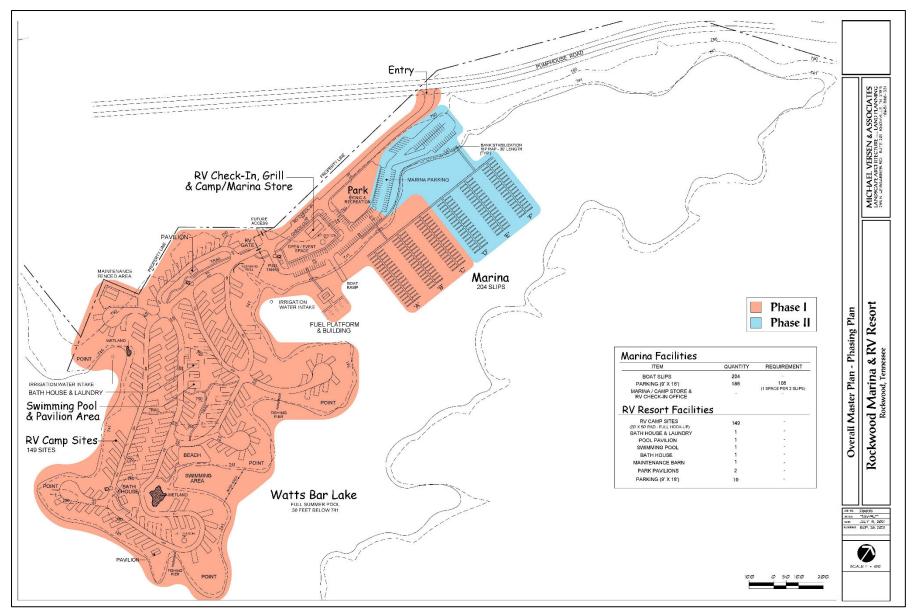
Proposed Rockwood Campground and Marina Phasing Plan
